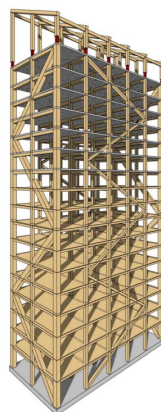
Structural system in Mjøstornet, Norway. (Abrahamsen (2018))
